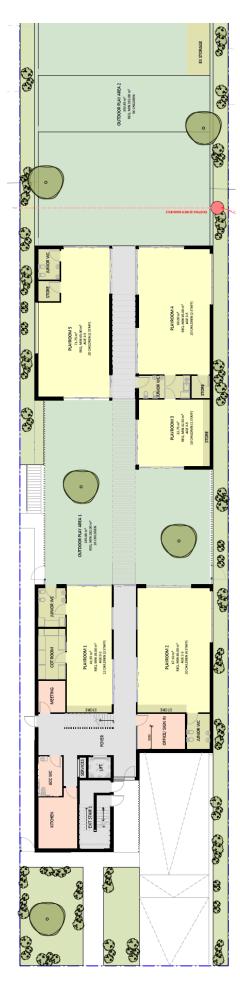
Partial site plan delineating location of on-site structures and landscaped areas.
